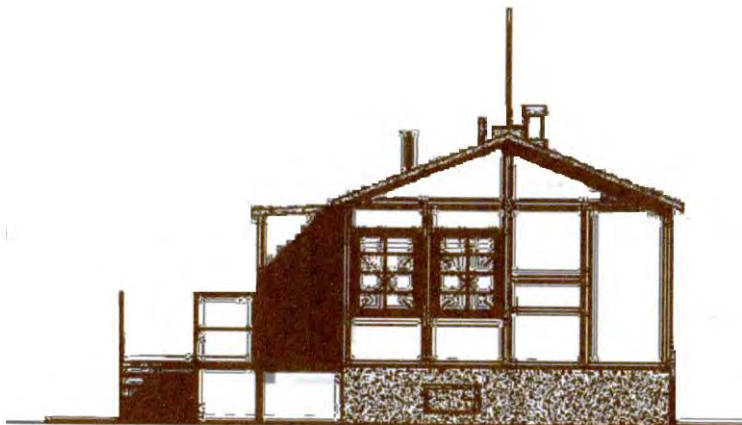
Grants-Milan Flight Service Station, West Elevation.
